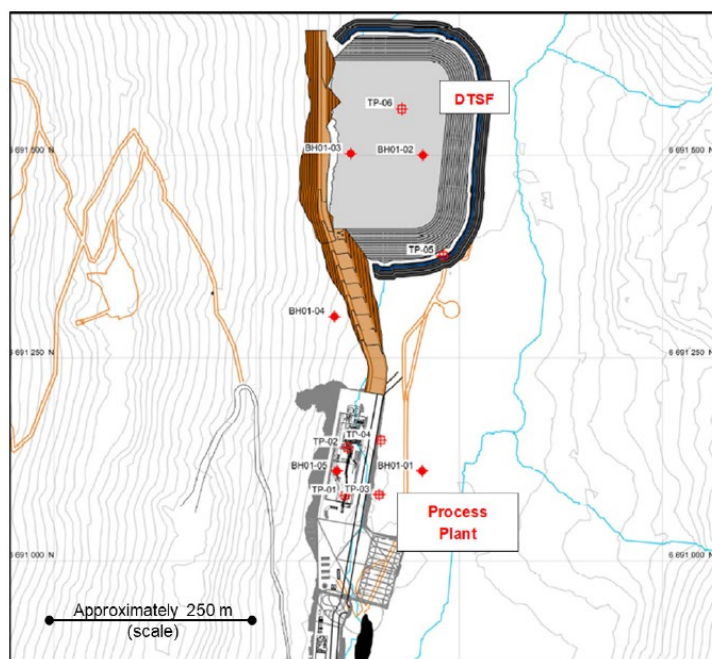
Area 3 Proposed DTSF and Process Plant Layout and investigation locations
